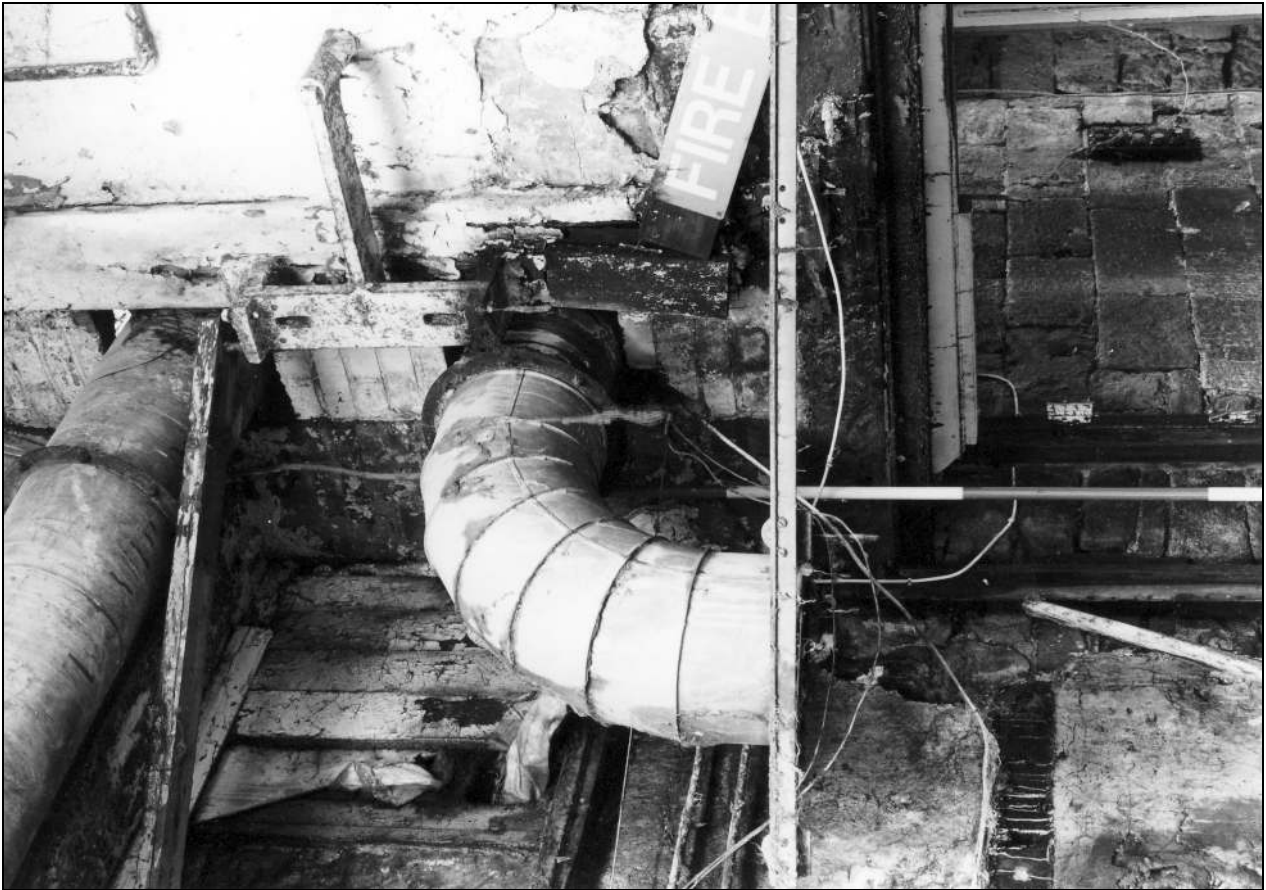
North-east corner of weaving shed, showing bearing from engine house and bracket for main shaft (film 1, frame 17)
